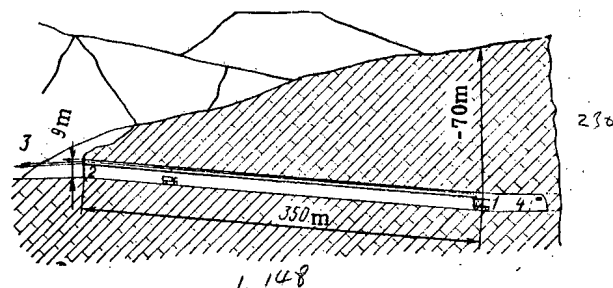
Layout of Saberio station: 1) underground laboratory; 2) entrance to stope tunnel; 3) communication line with surface laboratory; 4) ventilation opening.
